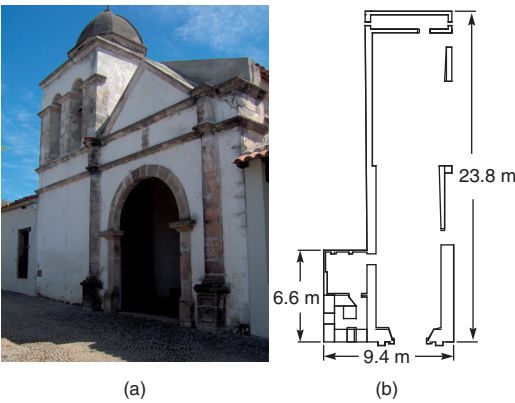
“Virgen del Refugio” Chapel (a) façade; and (b) plan view.
